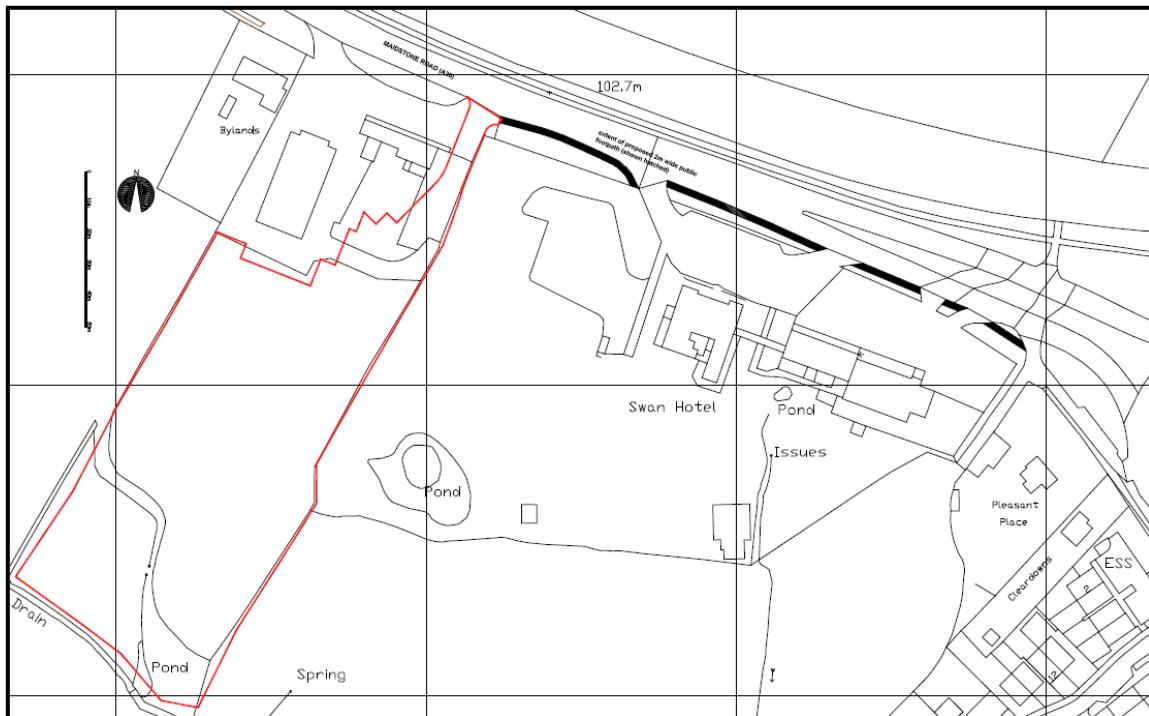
Proposed pedestrian/Cycle footway to link the site to the village
